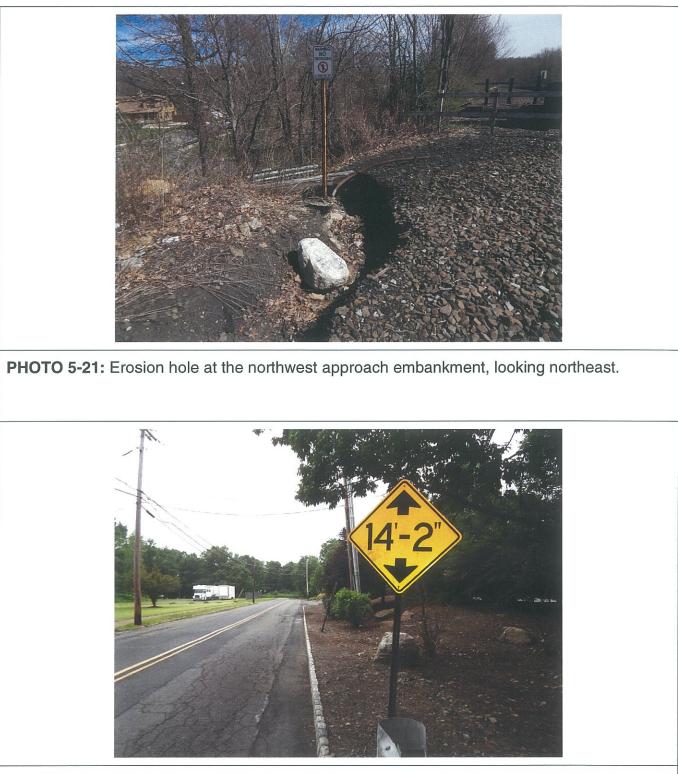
Work Done: 14'-2" Vertical clearance sign has been installed at the north approach of the Shippenport Road, looking south. Typical at south approach.
